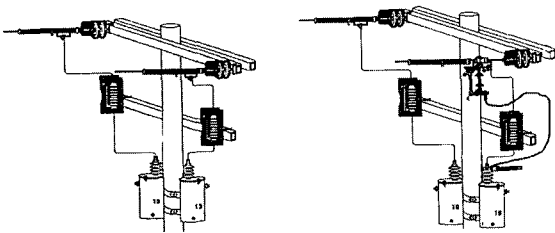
Insulating COS & Power Line (left) and Installing COS & Jumper Cable (right)
